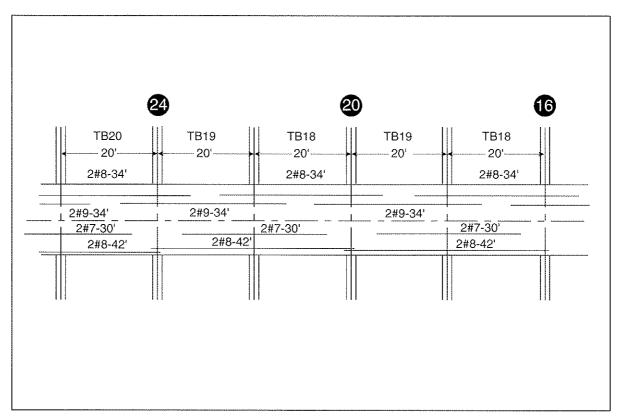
Schematic of distorted section showing reinforcing bar arrangement for spandrel girders on fourth through ninth floors at Column Line G.
